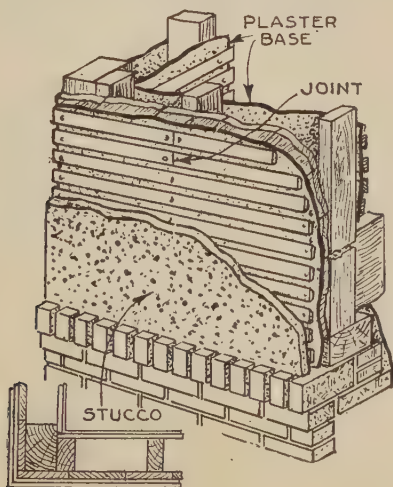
,127.—Stucco applied to new building. 10, broken joints.
